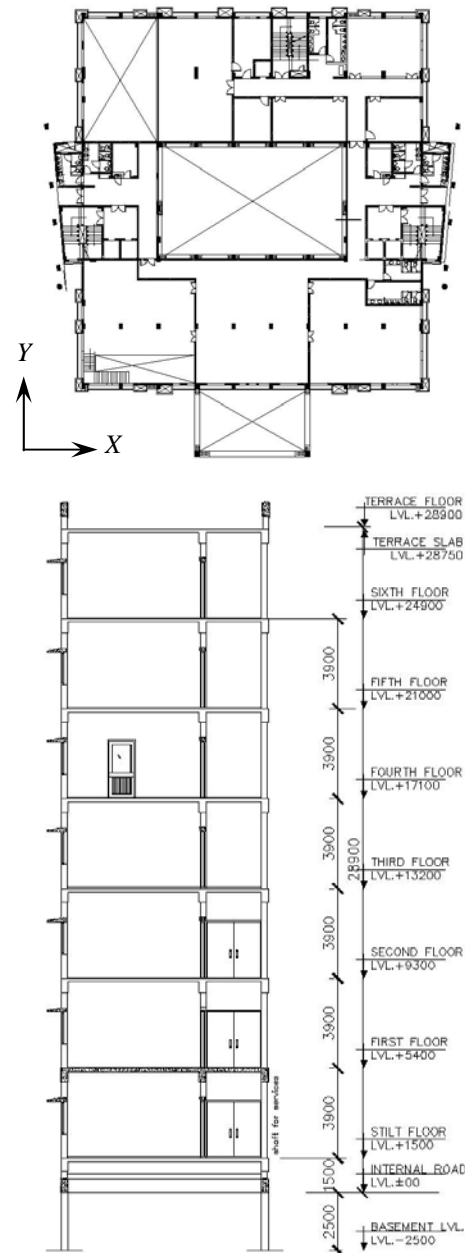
Typical Floor Plan and Sectional Elevation of the Real-Life Building
